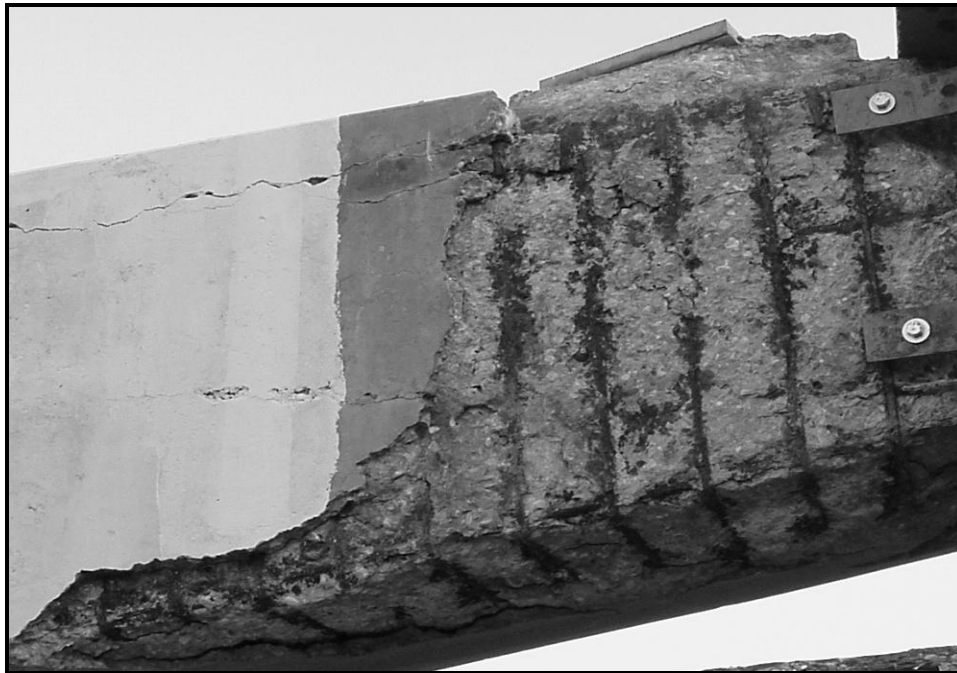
Spalling due to reinforcement deterioration on cap beam of Bent #4S
